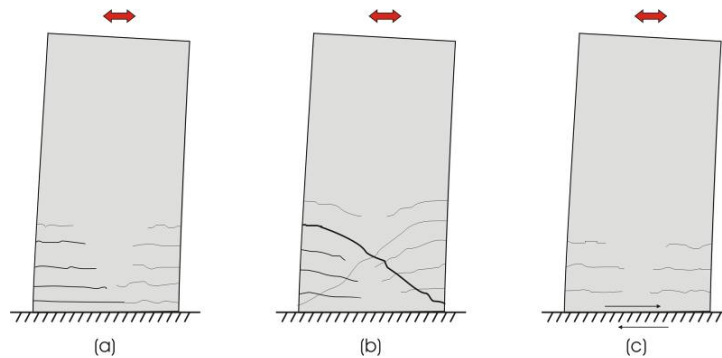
Typical failure modes observed in structural walls, (a) flexural; (b) Shear; (c) Sliding shear
